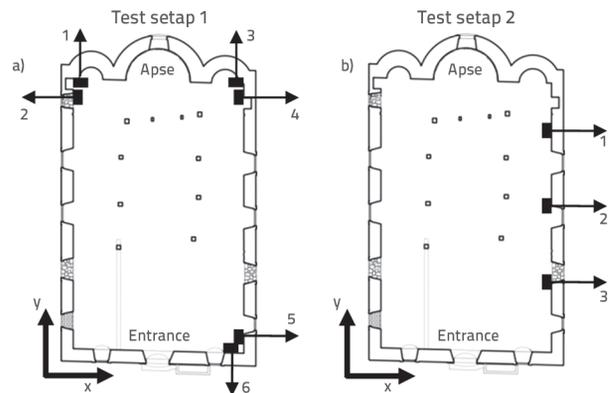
Plan view of sensor orientation for a) test setup 1, and b) test setup 2
